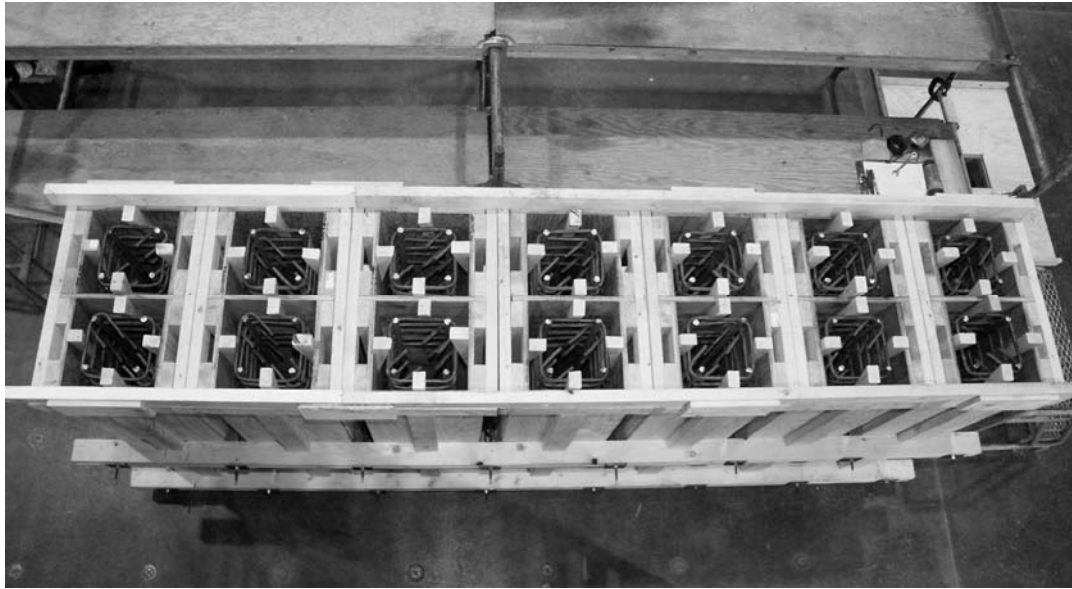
Column Formwork and Internal Reinforcing Cages before Casting
